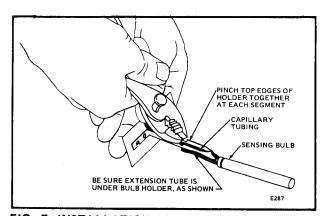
INSTALLATION OF BULB IN PLENUM BULB HOLDER.
